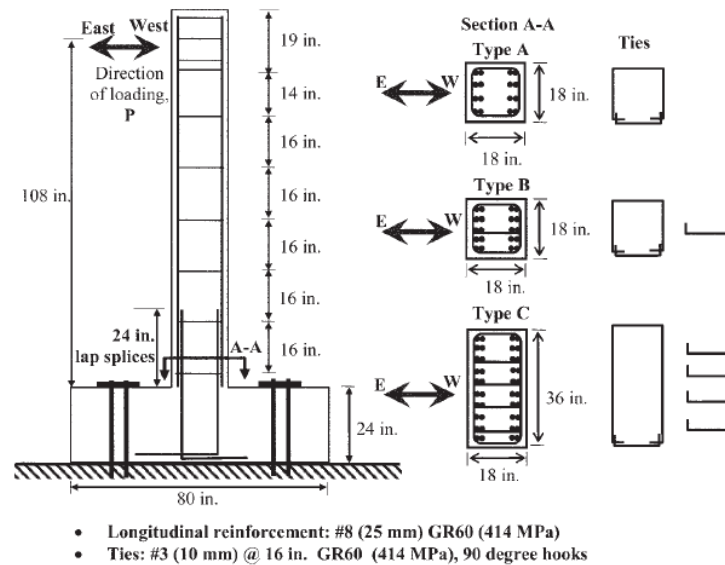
Structural details of columns tested by Kim et al. [38].
